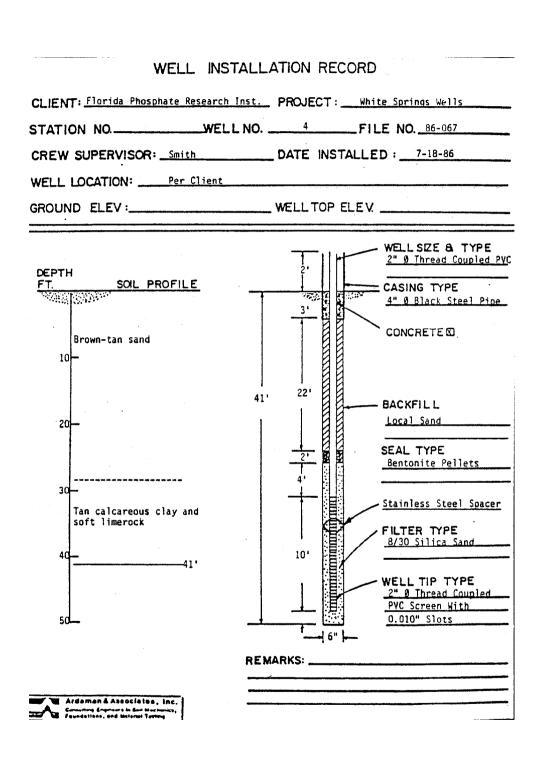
Well Installation Record at Well 4, White Springs Road.
